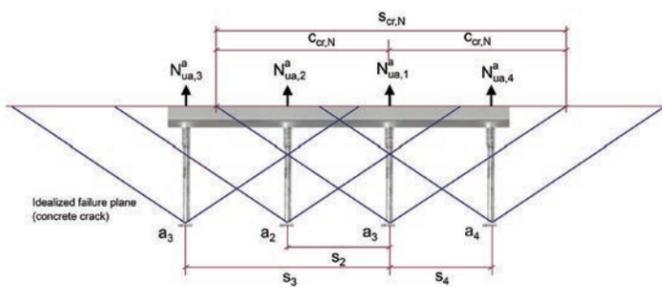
Example of anchor channel with non-uniform tension forces.
